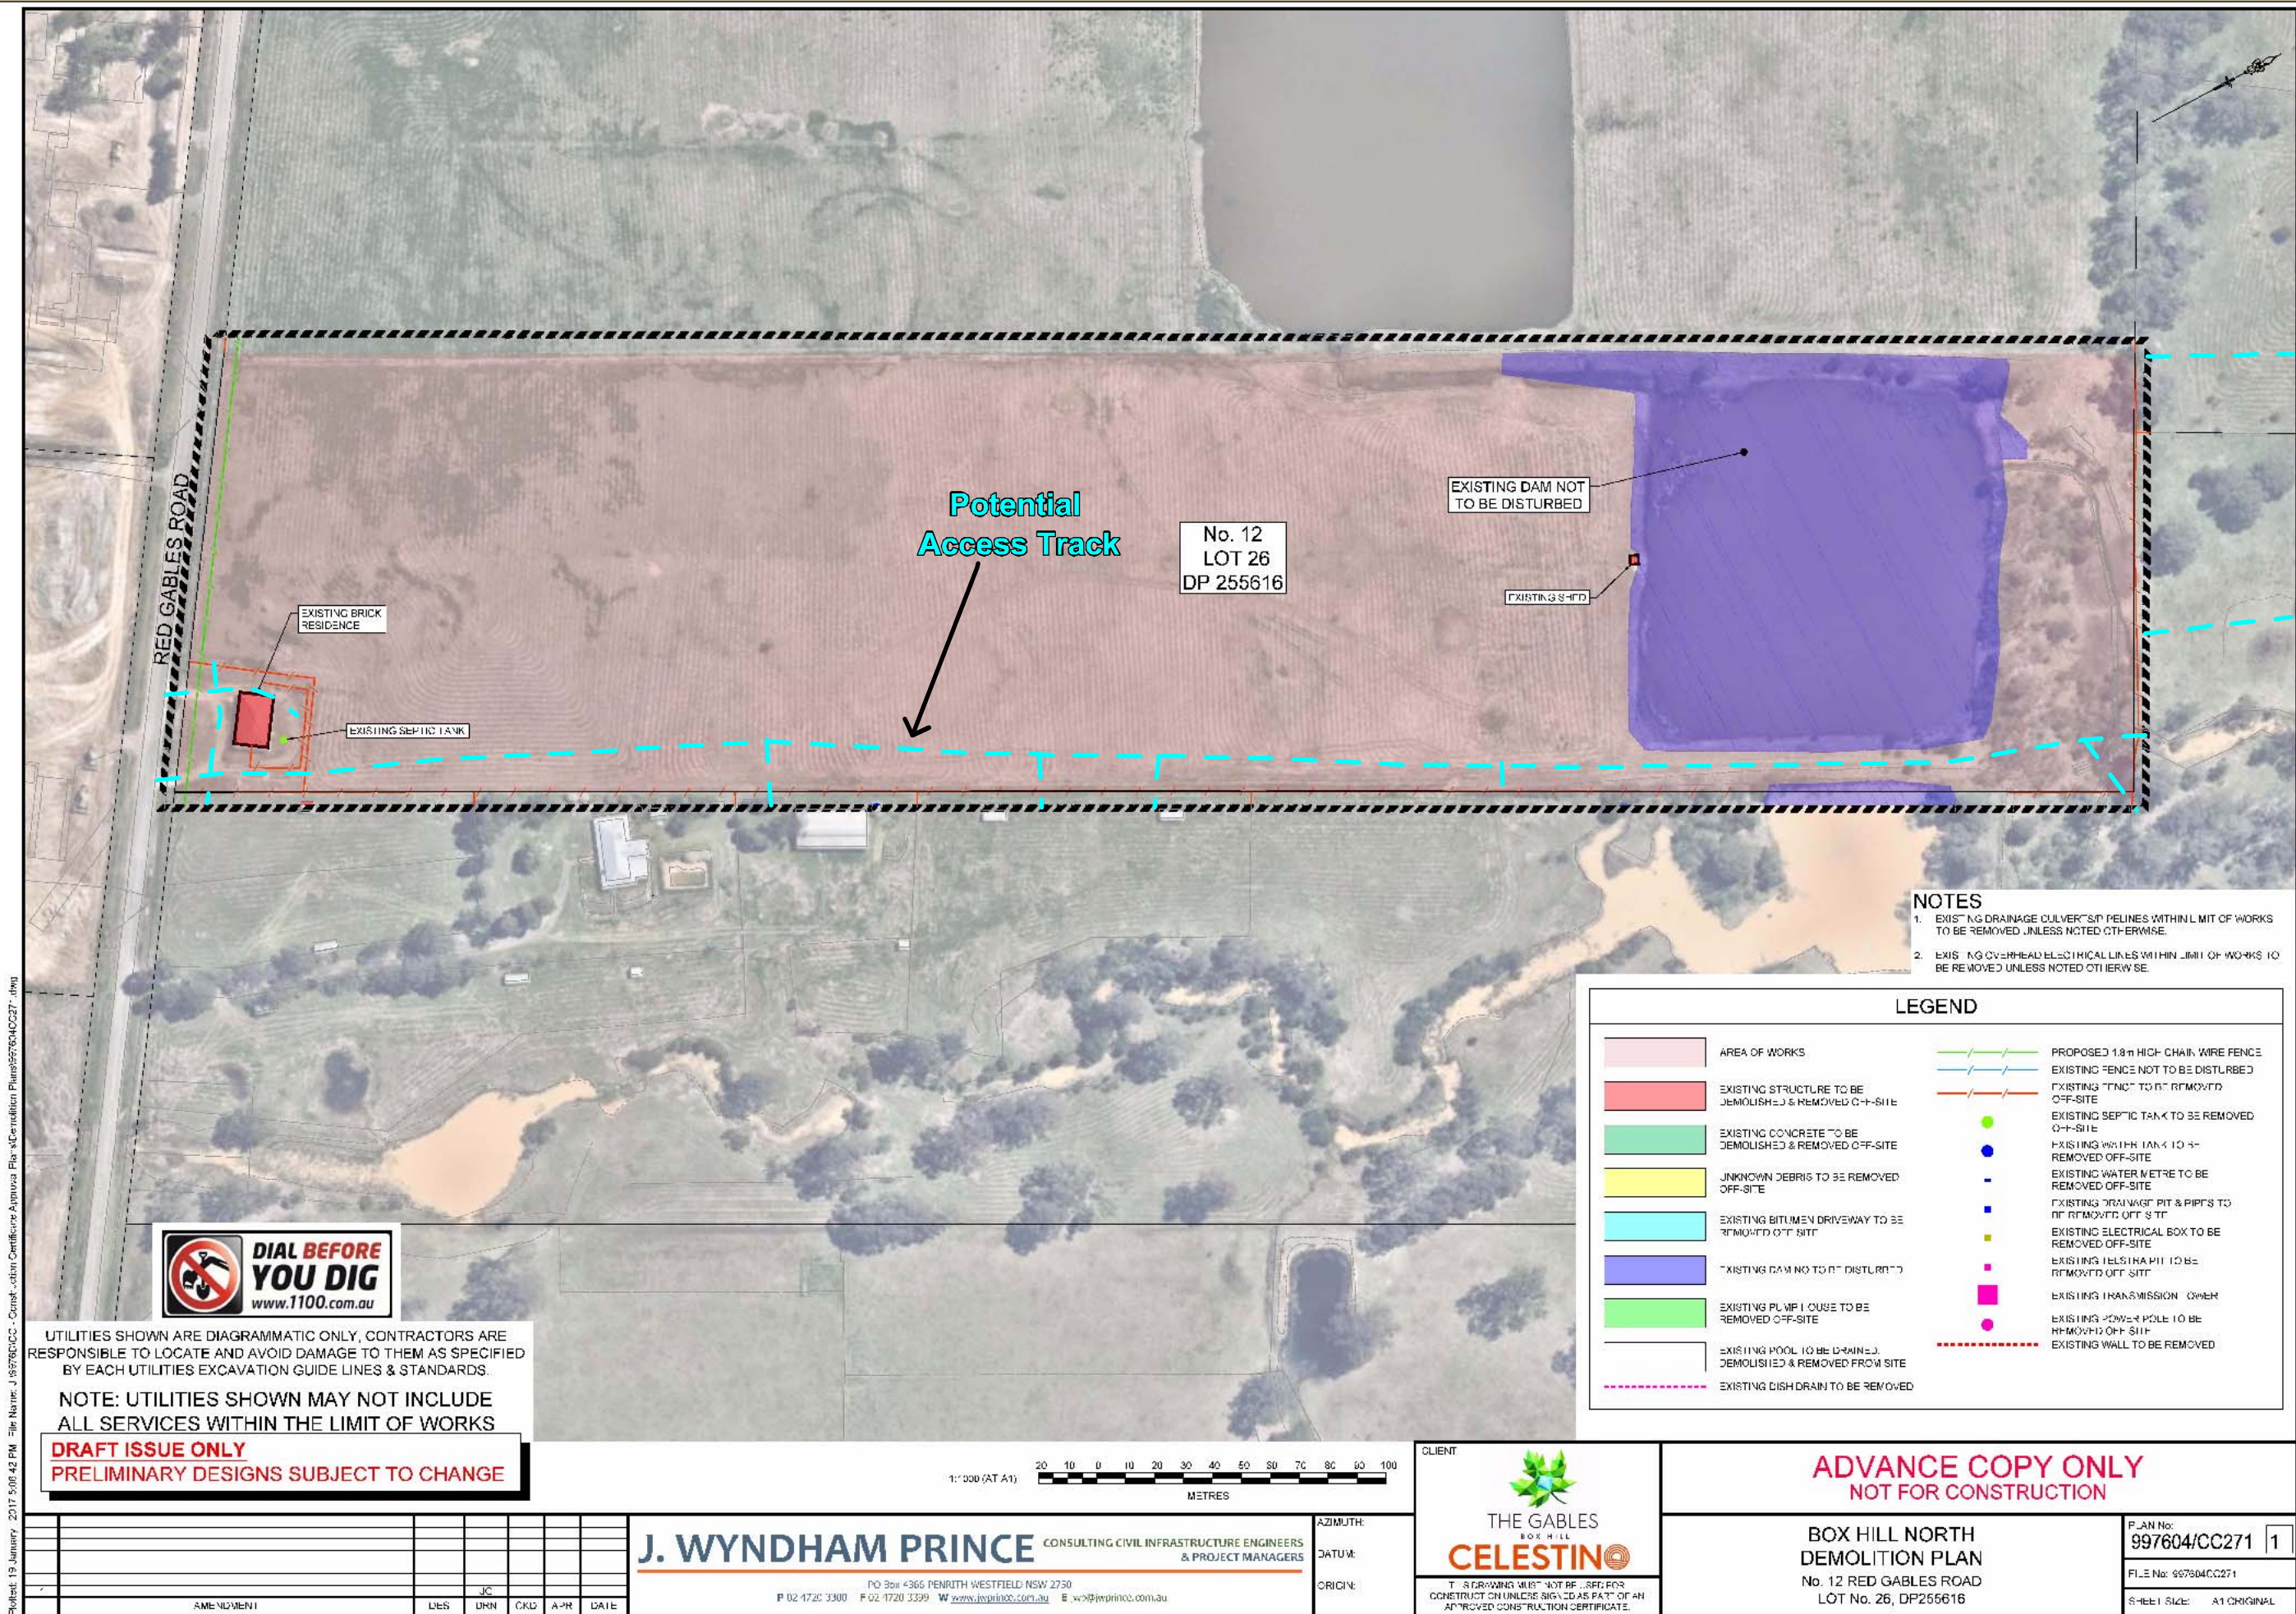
Demolition Sites and Potential Access tracks for 12 Red Gables Road
